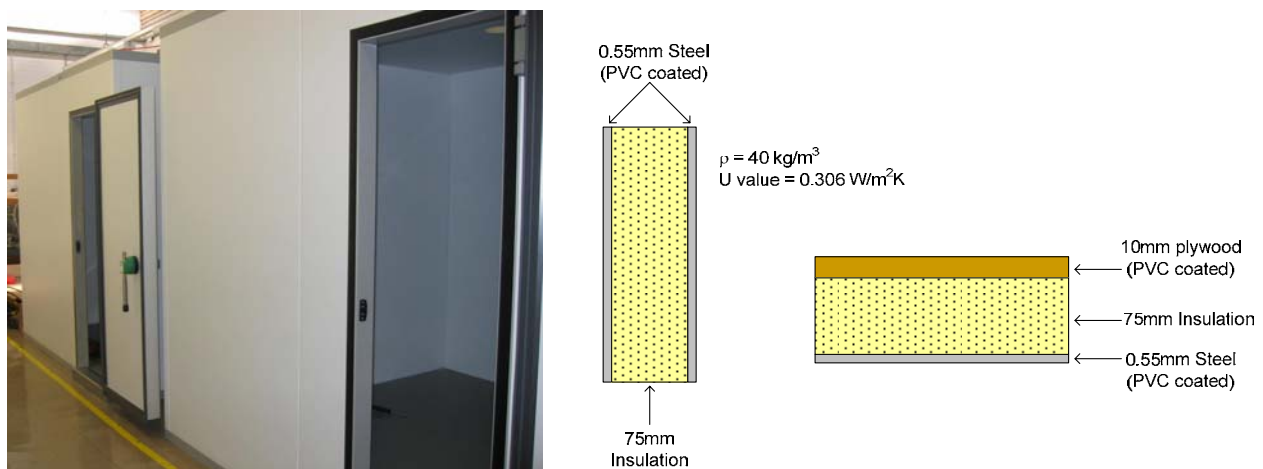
External view of test chambers (left) & schematic showing construction of walls, ceilings and floor (right)
